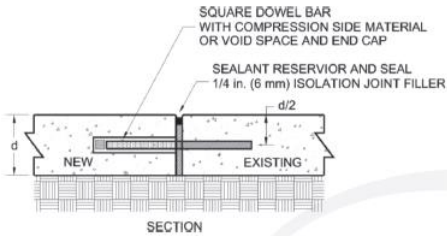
Transition between new and existing pavements with different joint spacing.
